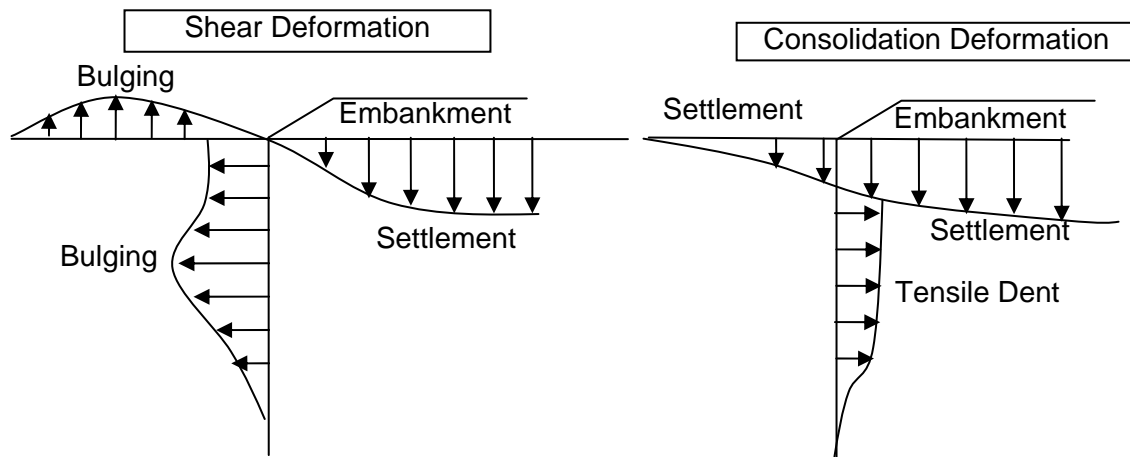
Typical Schematic Figure of Ground Deformation
